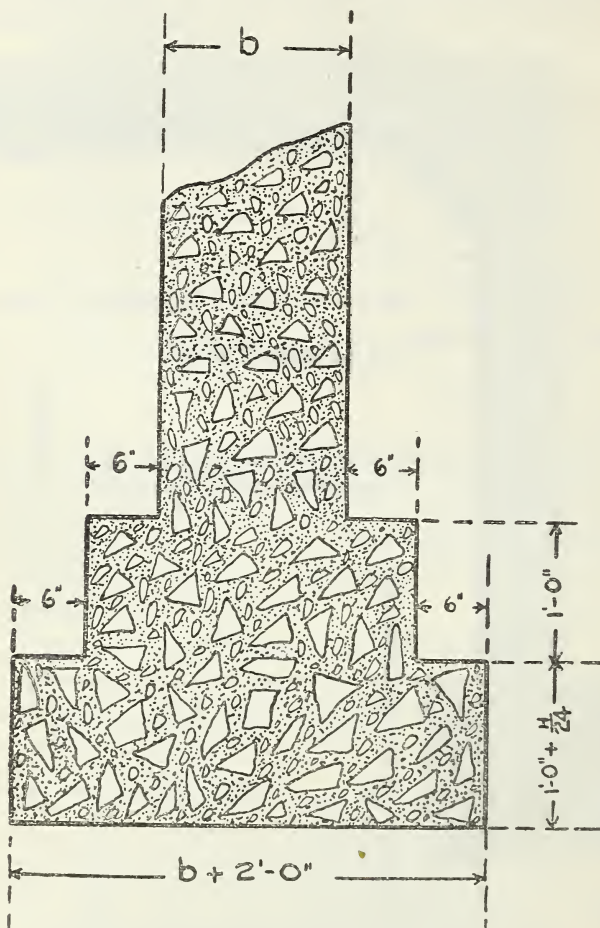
Double footing for a reinforced-concrete abutment wall.
